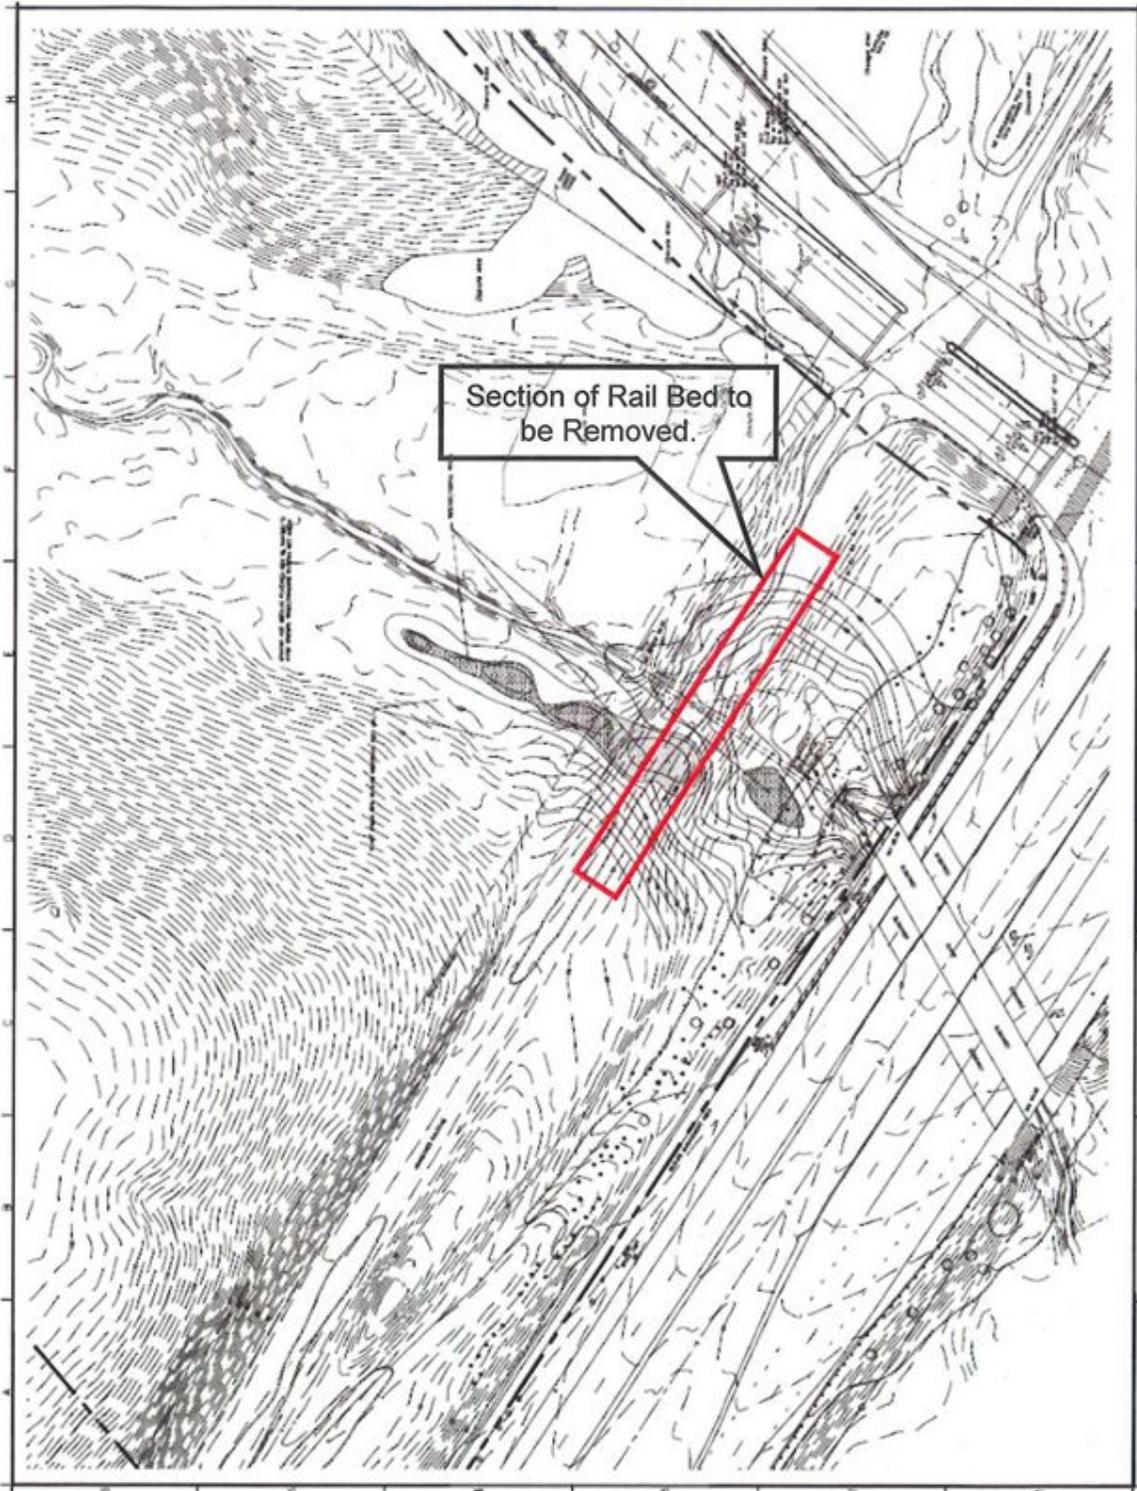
; Rail Bed Removal for Failed Culvert Demolition
